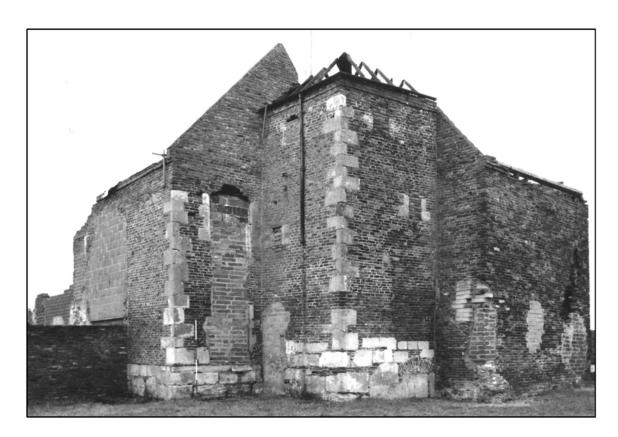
West side of farmhouse showing stair-tower, looking south-east, January 2004 (photo 1/8)
